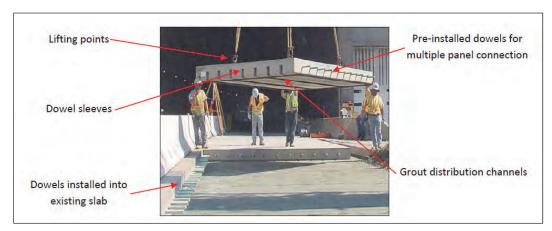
Super-Slab® installation at a tollbooth (Ashtiani et al. 2010).
